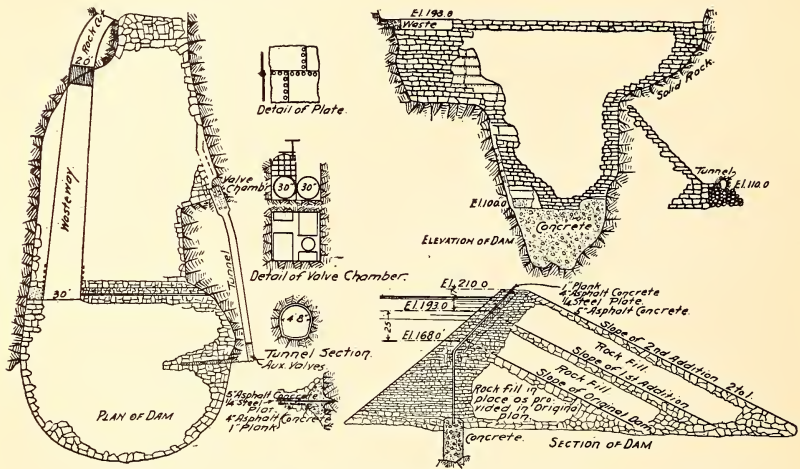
Plan, elevation, section, and details of East Canyon Dam, Utah.
